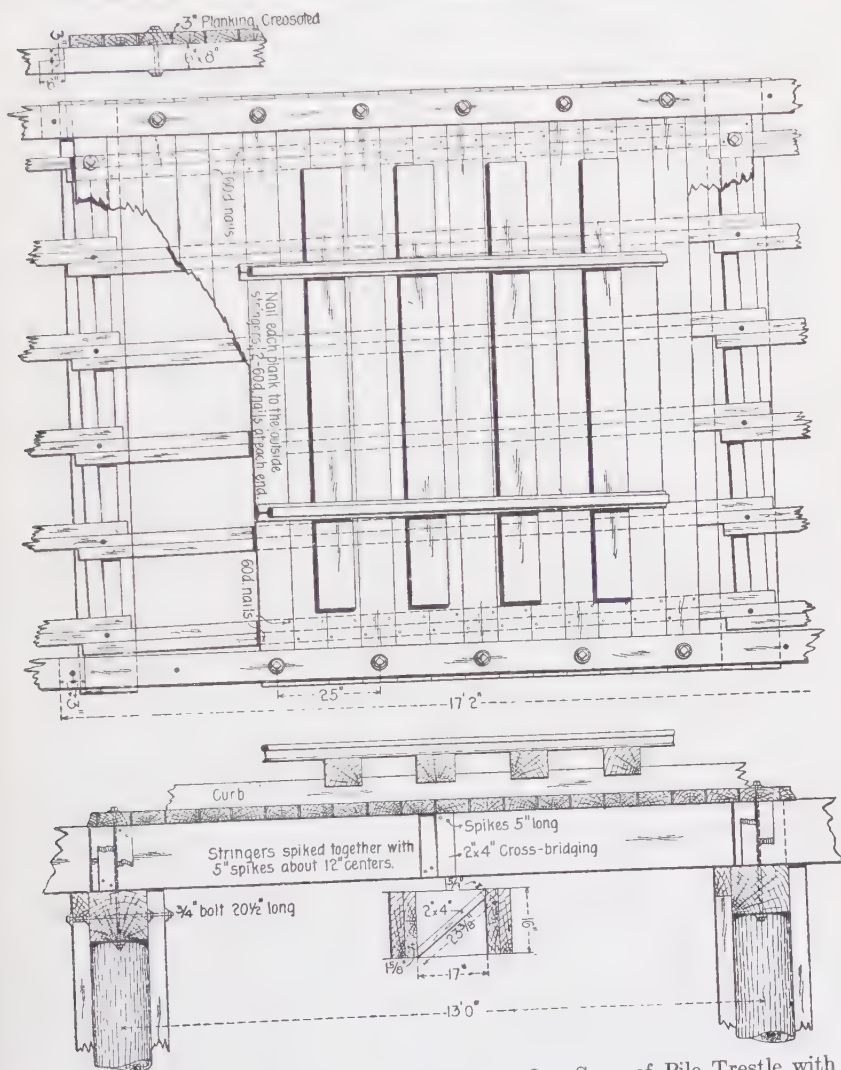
Plan and Longitudinal Section of One Span of Pile Trestle with Ballast Floor.
